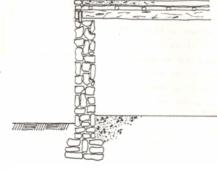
Section of adobe or stone wall construction (After Dr. Tariq Rafey)
